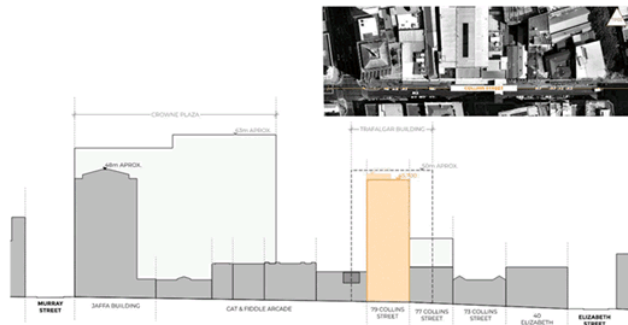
Excerpt from the submitted urban section showing that section of Collins Street between Murray Street and Elizabeth Street. Note the Trafalgar Building is dotted in for context, being located on the opposite side of Collins Street.
